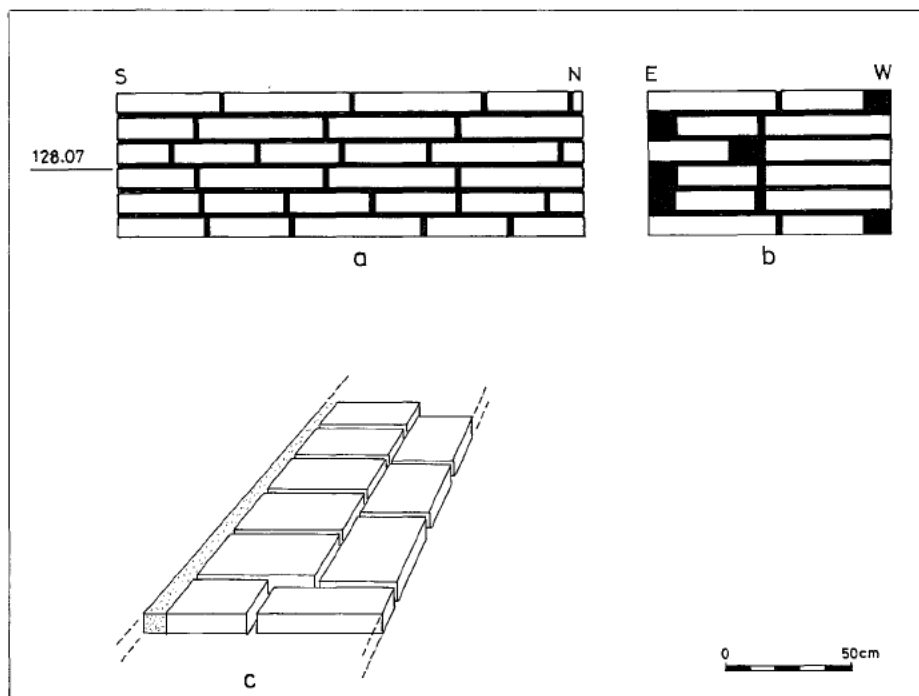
Example of brick-laying technique in Wall 106 of Building 232. a) segment of the eastern face of the wall; b) a cross-section of the wall as seen from the north; c) an isometric view of a course.
